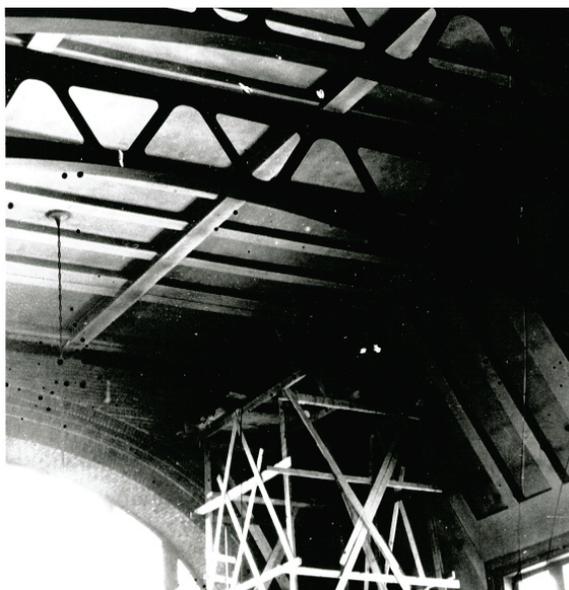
Quebec City : Gare du Palais train station interior: fallen row of bricks, damaged leaded windowpanes. Hodgson (1950) and Bruneau and Lamontagne (1994) described the damage to this construction. Additional details in Lamontagne (2007). *Photograph by E.A. Hodgson. (NRCan photo: 2012-077).
